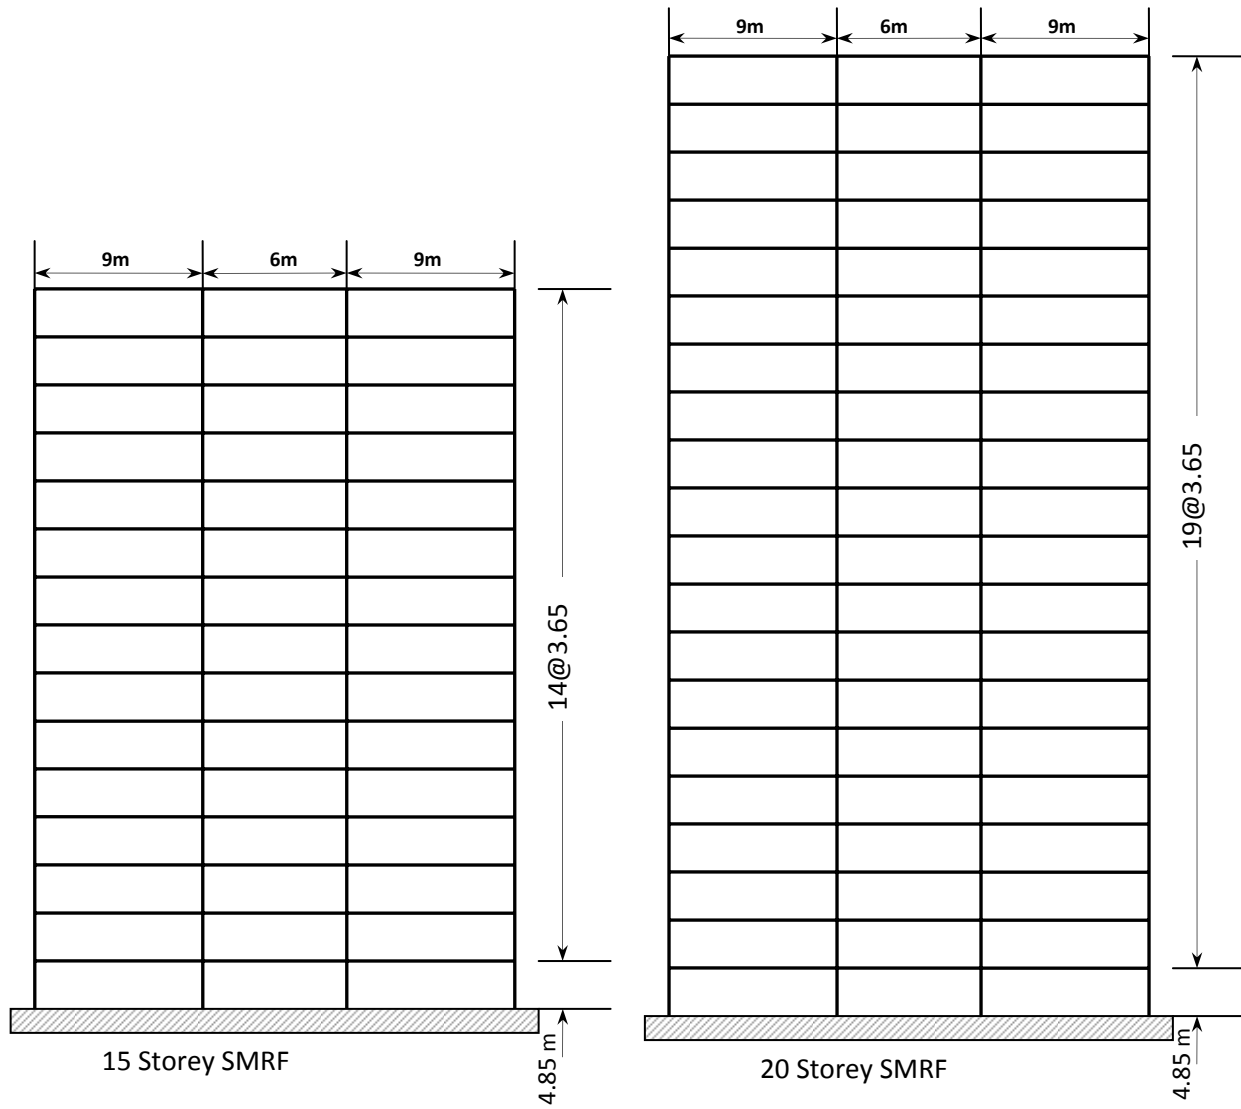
Elevation of 15 & 20 Storey Frames.
